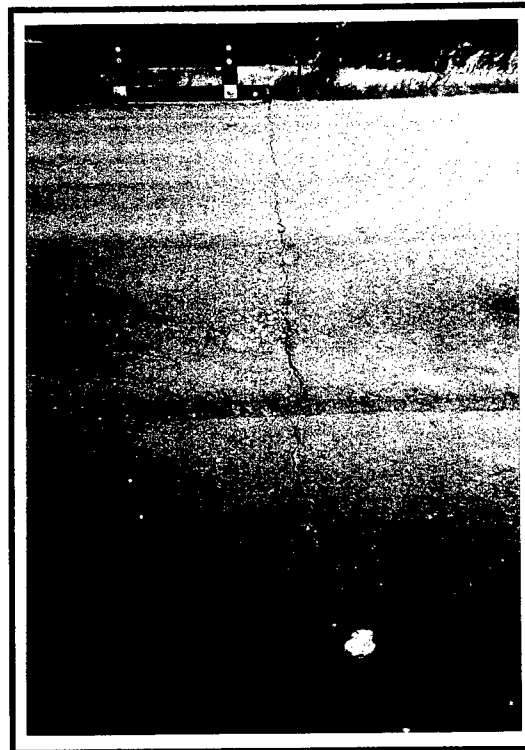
Transverse Pavement Crack Over Deck Abutment Cap Support
